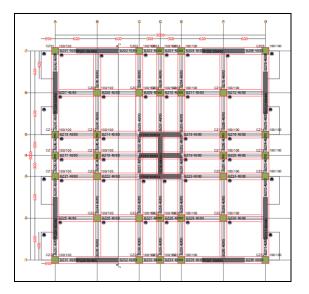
Typical floor plan of the building with support braced system (Model 2).
